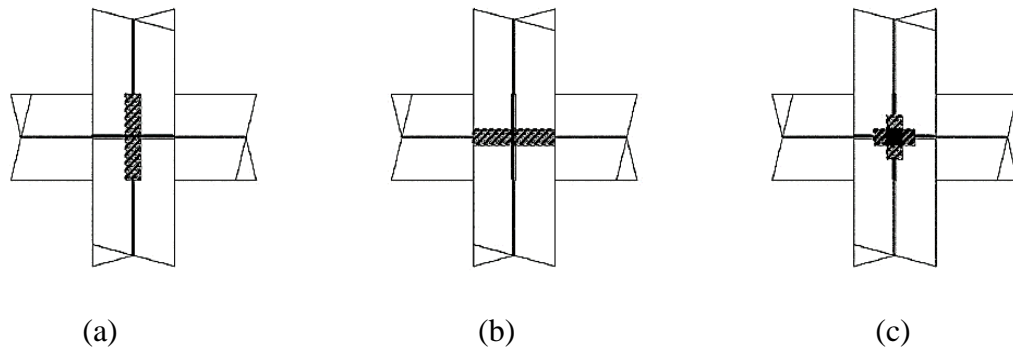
Beam-column joint model as per ASCE-41 (2017) for effective stiffness considered in the present study, when ratio of flexural strength of columns and beams framing into joint is: (a) greater than 1.2. (b) less than 0.8, and (c) in between 0.8 and 1.2
